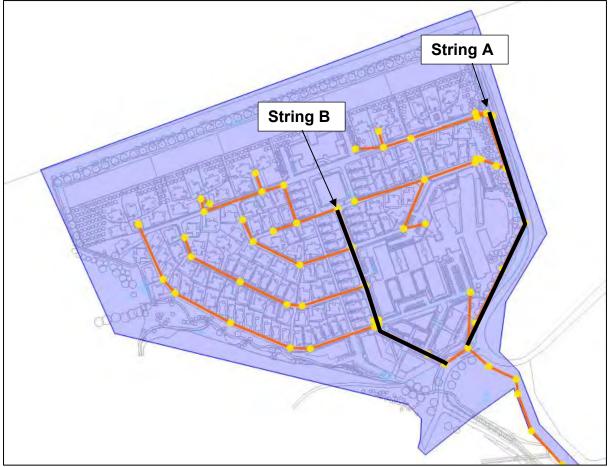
Reticulation Layout Plan – Highlighted Critical Pipe Strings
